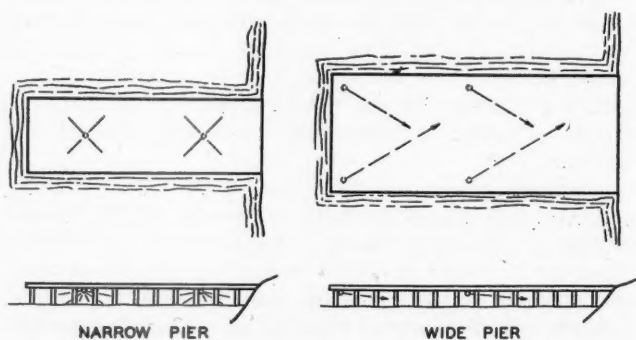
Protective Lighting for Small Piers Can Consist of Vapor-Proof Lighting Units Under the Floors; Larger Piers May Use Regular Floodlights
